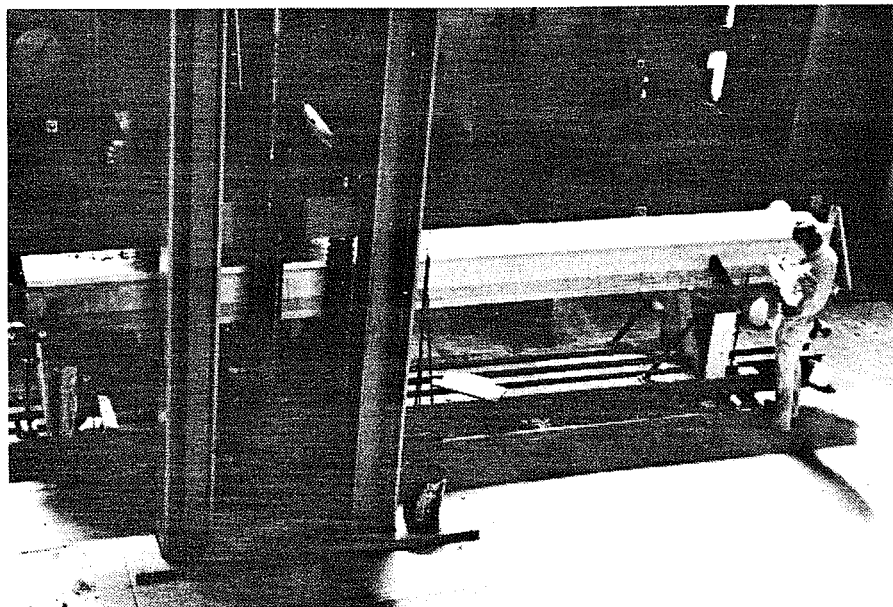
Photograph of loading system for shear tests of Specimen 2
